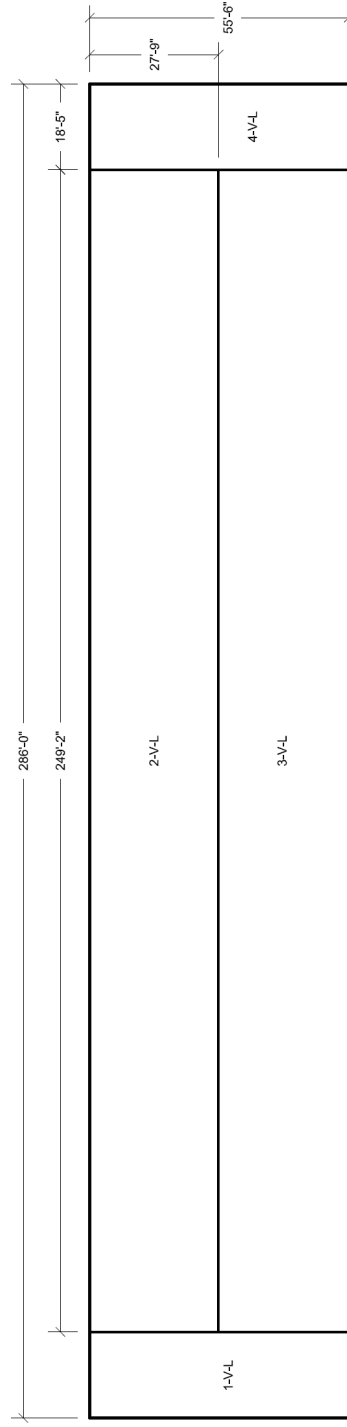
H.6-111: COOLING TOWER NORTH (AND SOUTH) WALL LOOKING SOUTH (NORTH)
